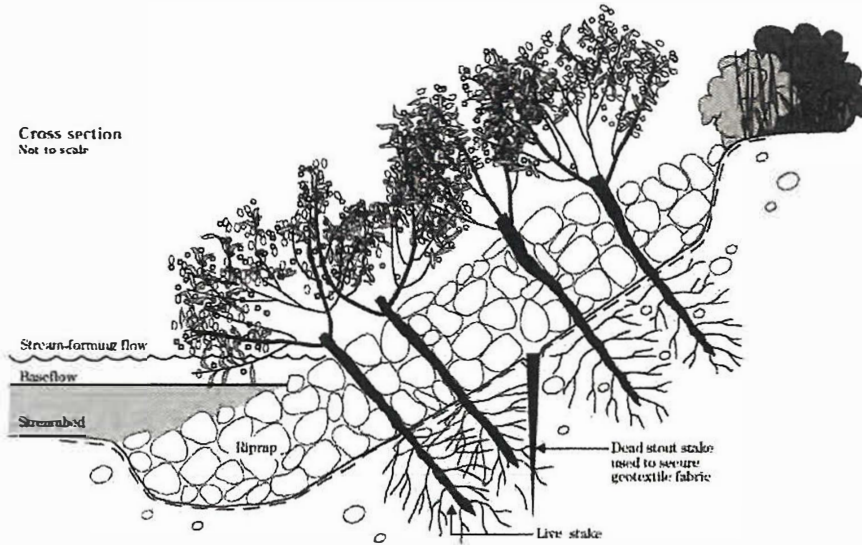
Joint Planting Detail (Features 2, 5 and 6)
